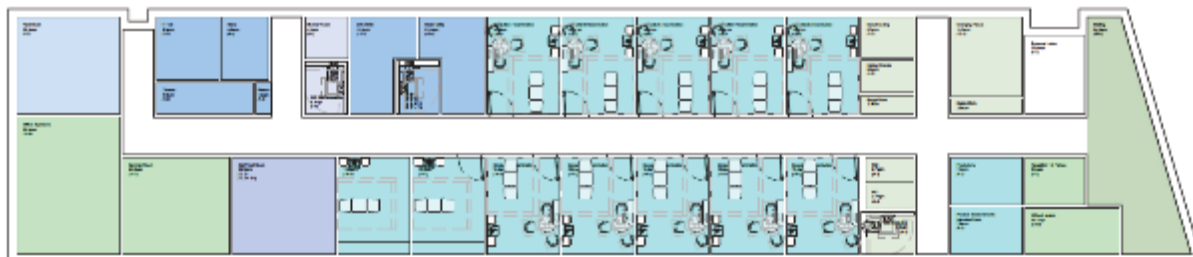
proposed building layout for Clipstone Park health and wellbeing facility.
